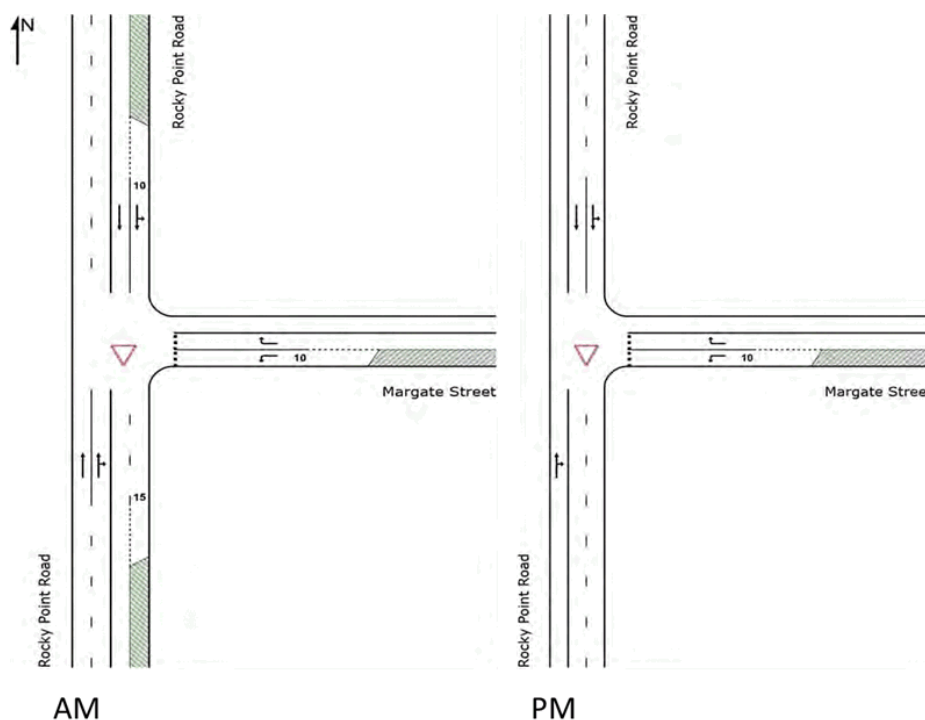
Intersection Layout at Rocky Point Road/Margate Street
